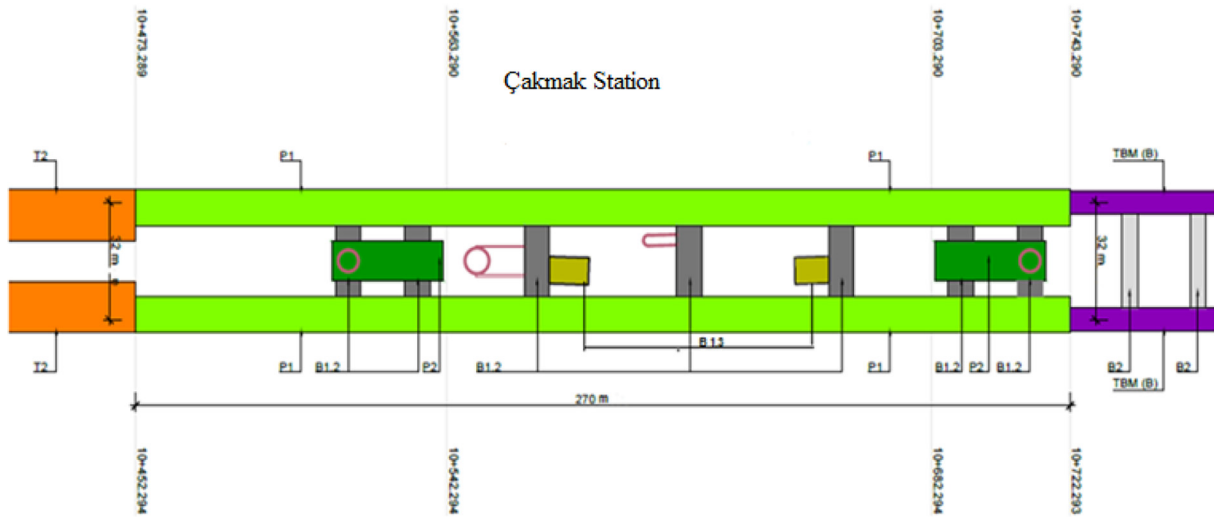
Çakmak Station tunnel plan (IMM, 2013).
